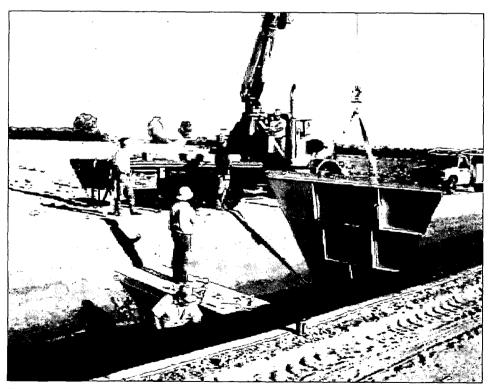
The upstream ramp of a 3 m wide (10 ft) weir is hoisted into place after the sill has been installed (Arizona).
